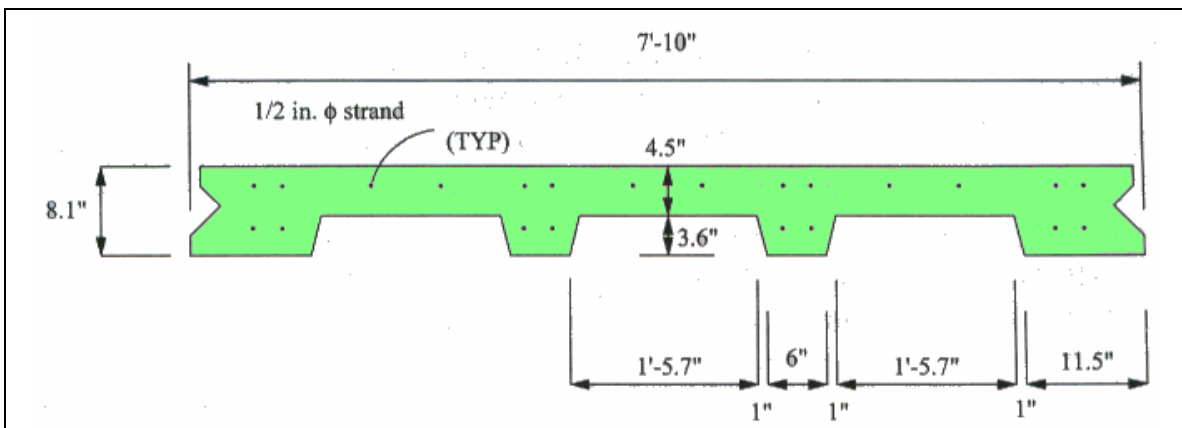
Typical full-depth precast, prestressed panel section (Tadros and Baishya, 1998)
